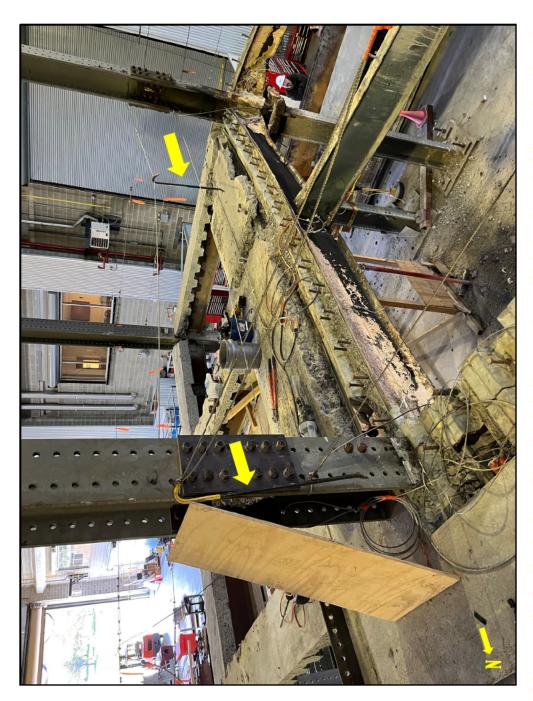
Images of the surrounding floor showing the conditions after the incident - crowbars are hooked on the passive fall protection cables (yellow arrows) and extra cable is haphazardly found near the column on the concrete slab. Looking southeast.
